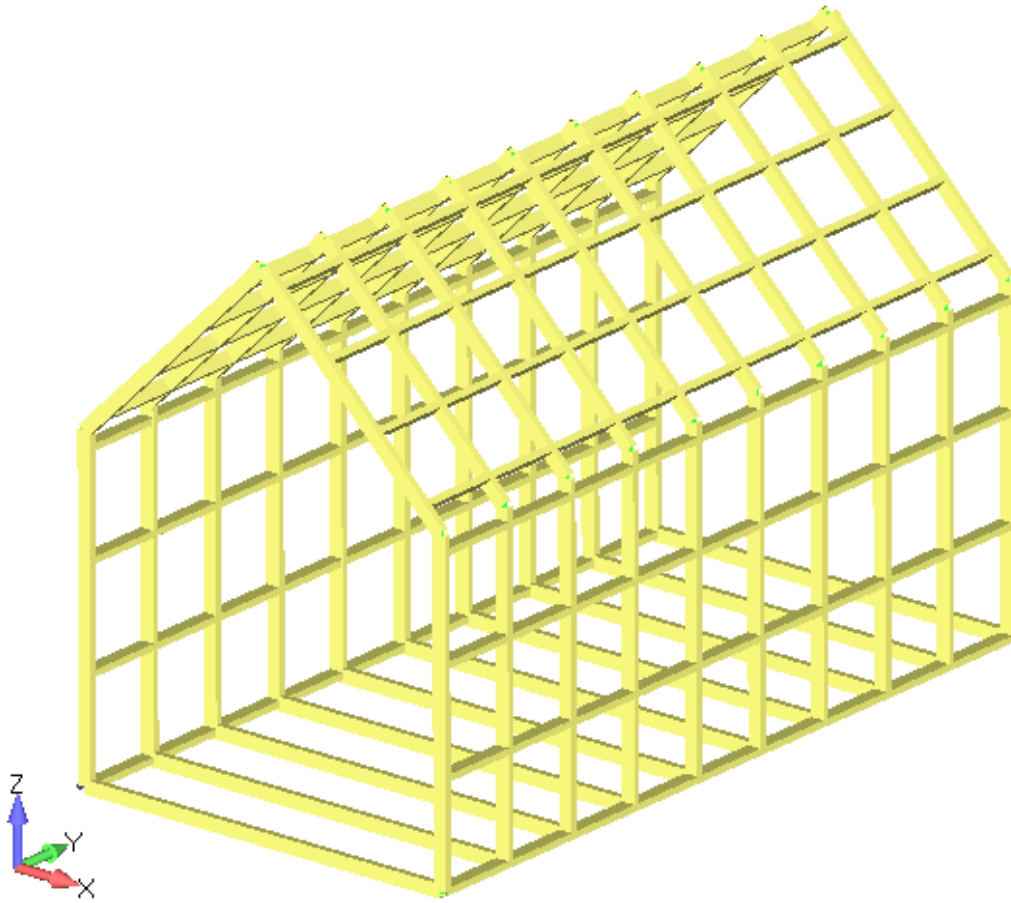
General view of the FINHA-A 100 gable roof building frame, 3.0 meters wide, slope is 45 deg.
